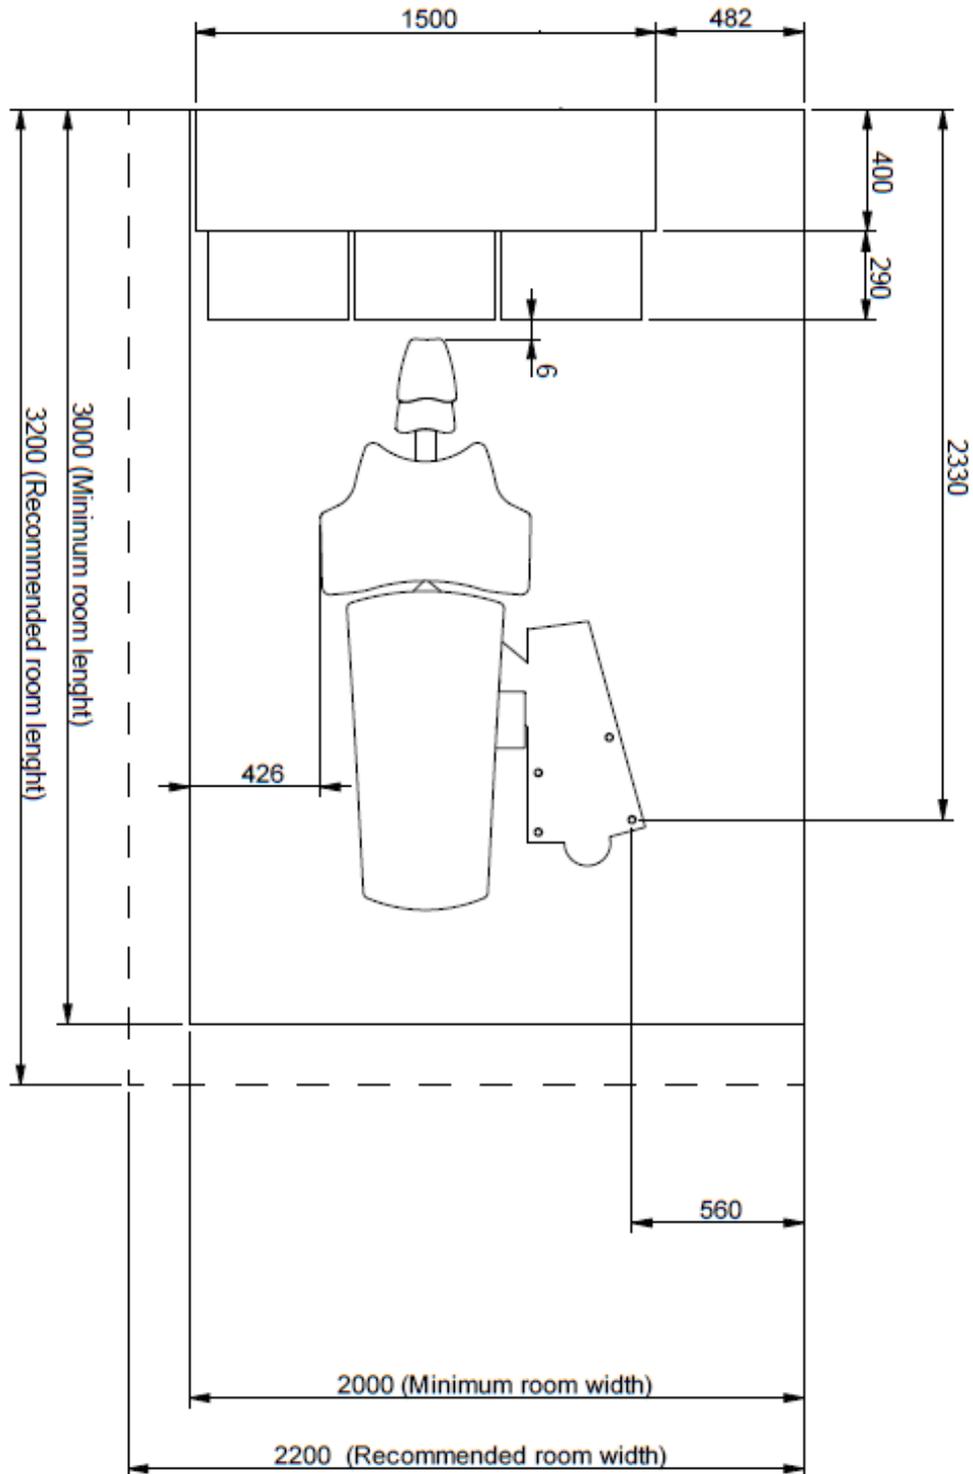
Plan of installation XO FLOW unit and XO WORKTOP (all measures in cm)
